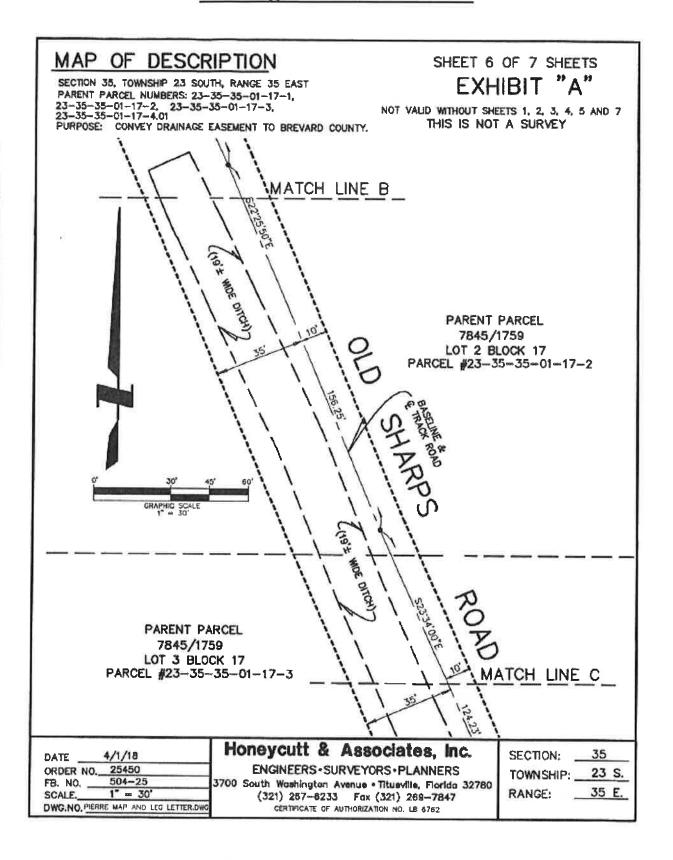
Copy of sketch sheet 6 of 7 of right-of-way Old Sharpes Road.
